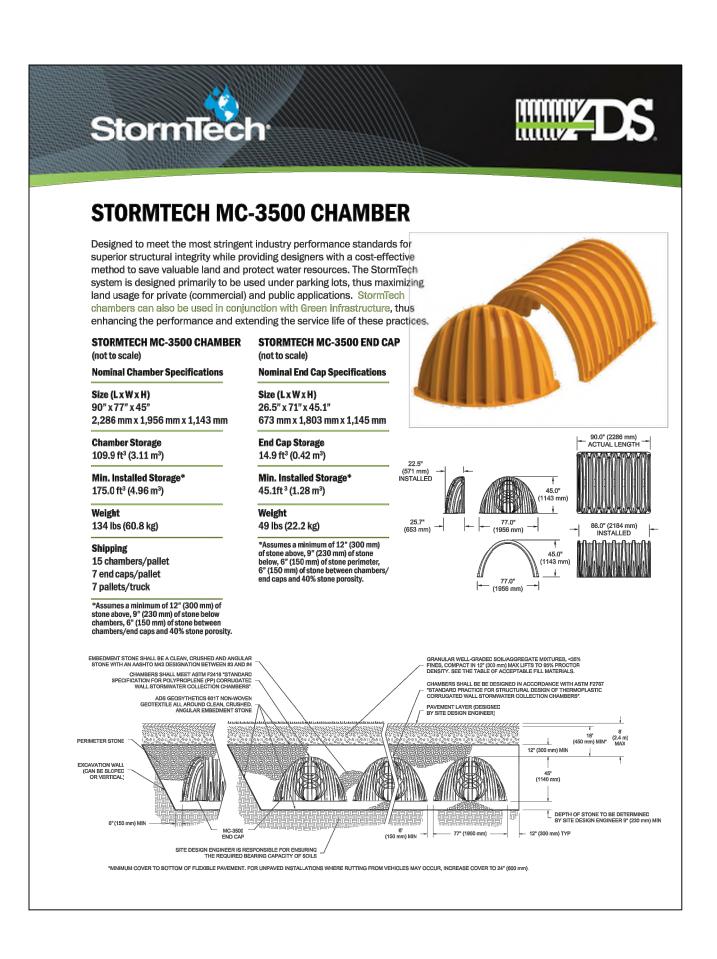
UNDERGROUND DETENTION N.T.S.
